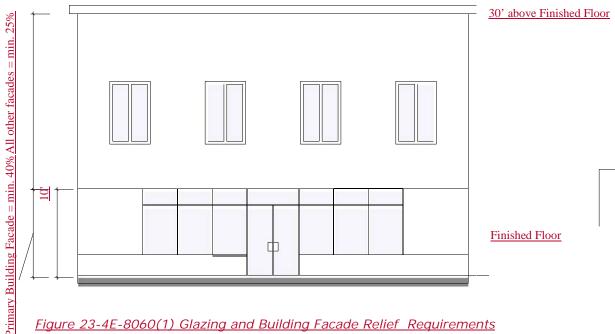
E-8060(1) Glazing and Building Facade Relief Requirements
